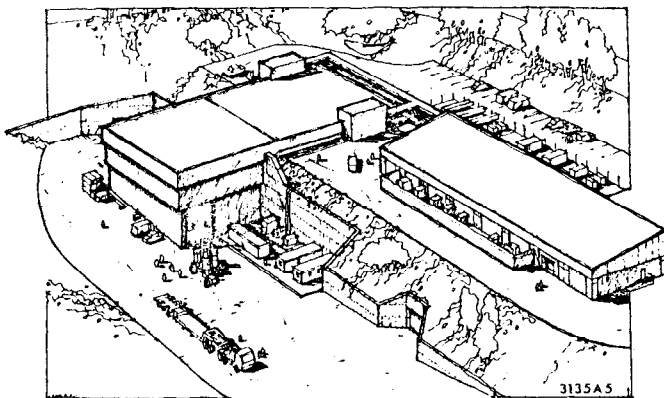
Architectural sketch of the experimental hall and support building at Region 8.
